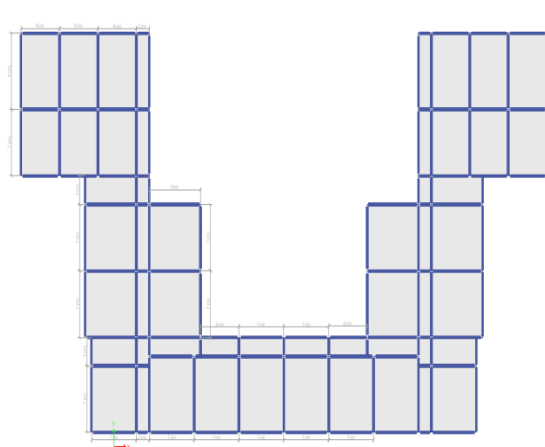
Plan of Commercial Building (G+4) Fig 2: Beam- Column Layout of the Structure
